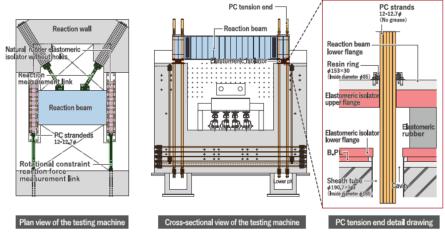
Plan and cross section of the full-scale seismic isolation tester
